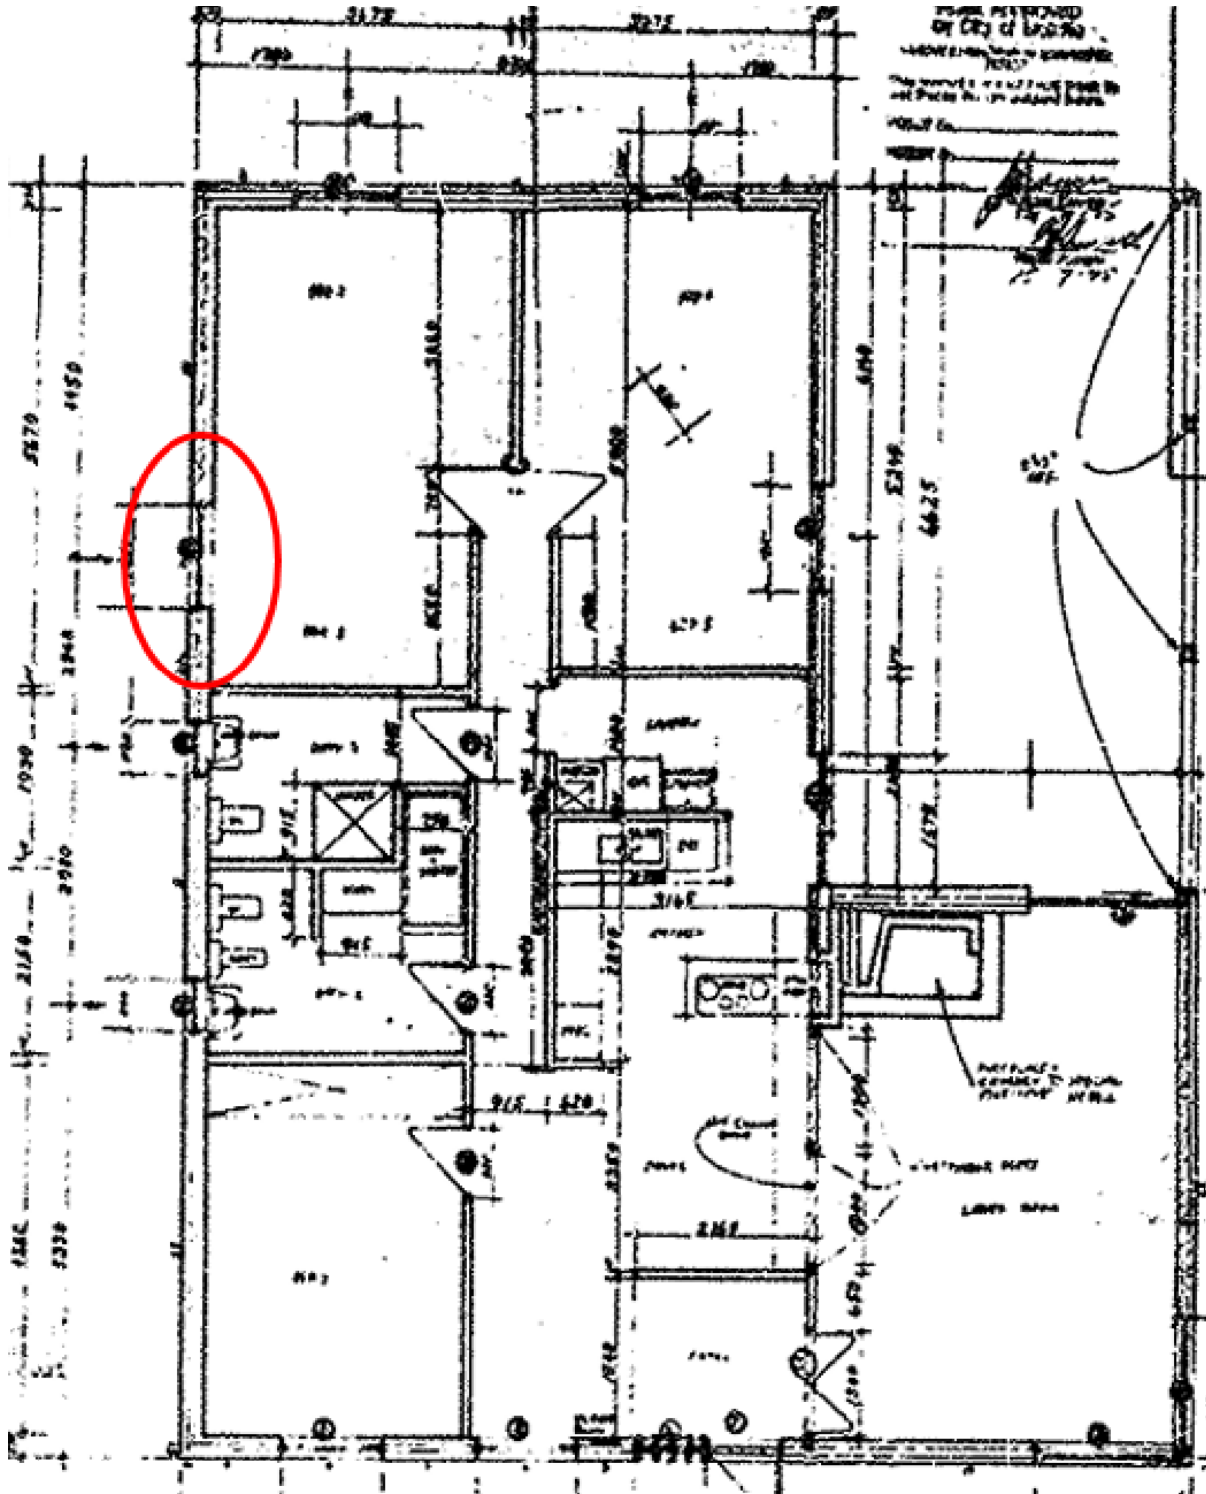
Floor plan of adjoining residence (26 McBeth Way) – red circle highlights major opening to western lot boundary (adjacent to subject site)
